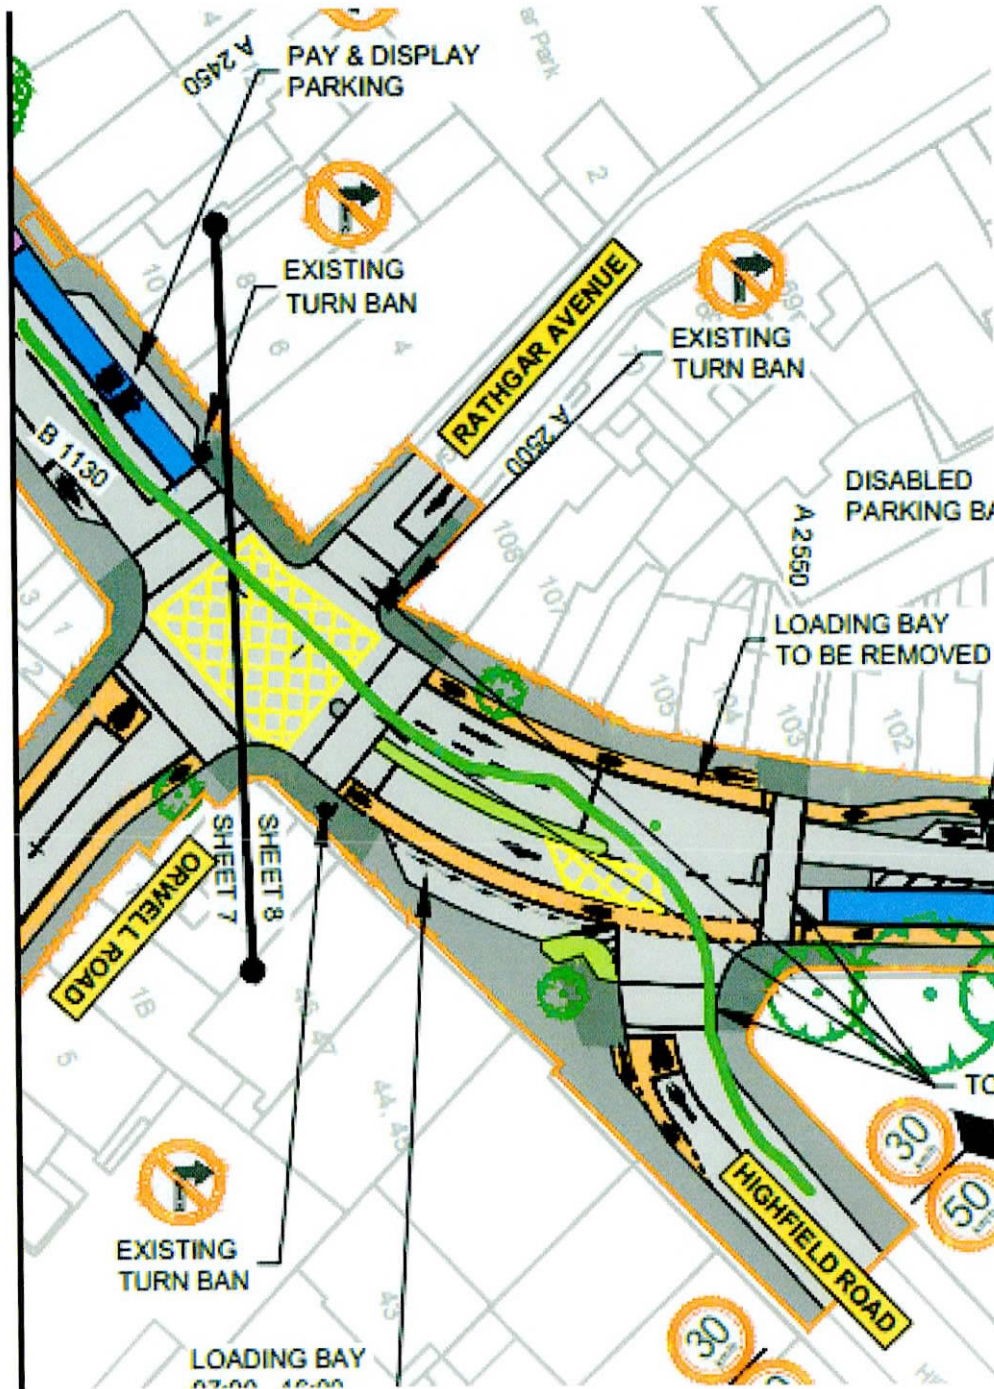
Extract from Sheet 11 of the General Arrangement drawing illustrating the intersection of Terenure Road East and Rathgar Avenue/Orwell Road and Highfield Road.
